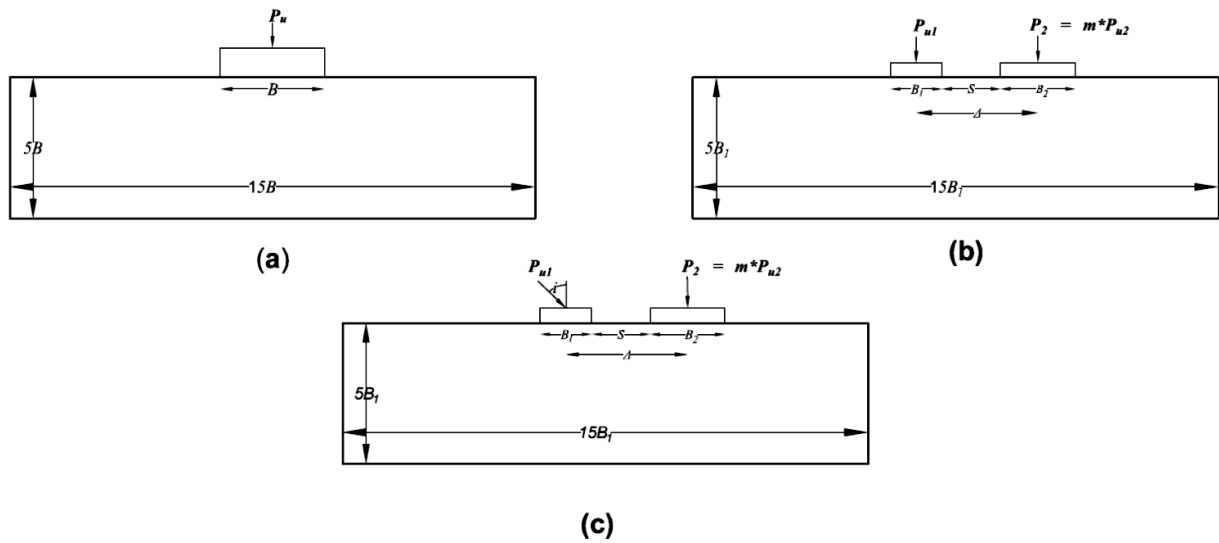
Geometry of strip footing models and soil foundation domain for (a) Isolated footing, (b) Interfering strip footing under vertical loads, and (c) Interfering footing under oblique loads
